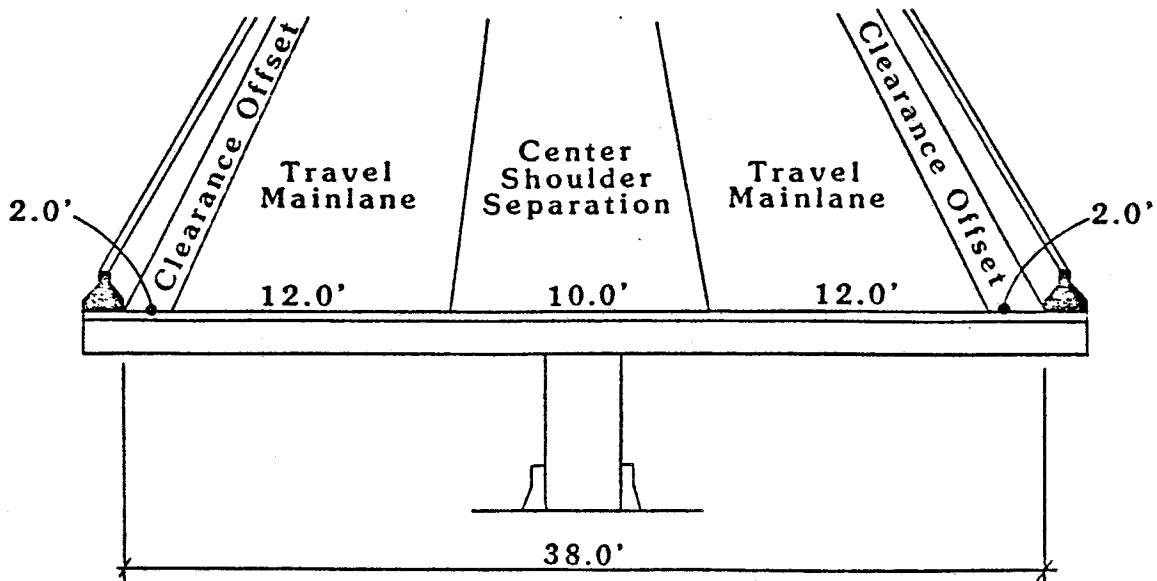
Total Mainlane Cross-Section For Single and Multiple Lane, Elevated Transitways
